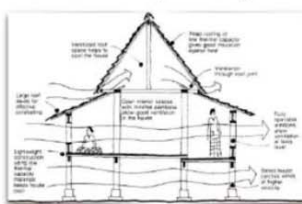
Typical Thai vernacular house (Source: Lim, 1987)
